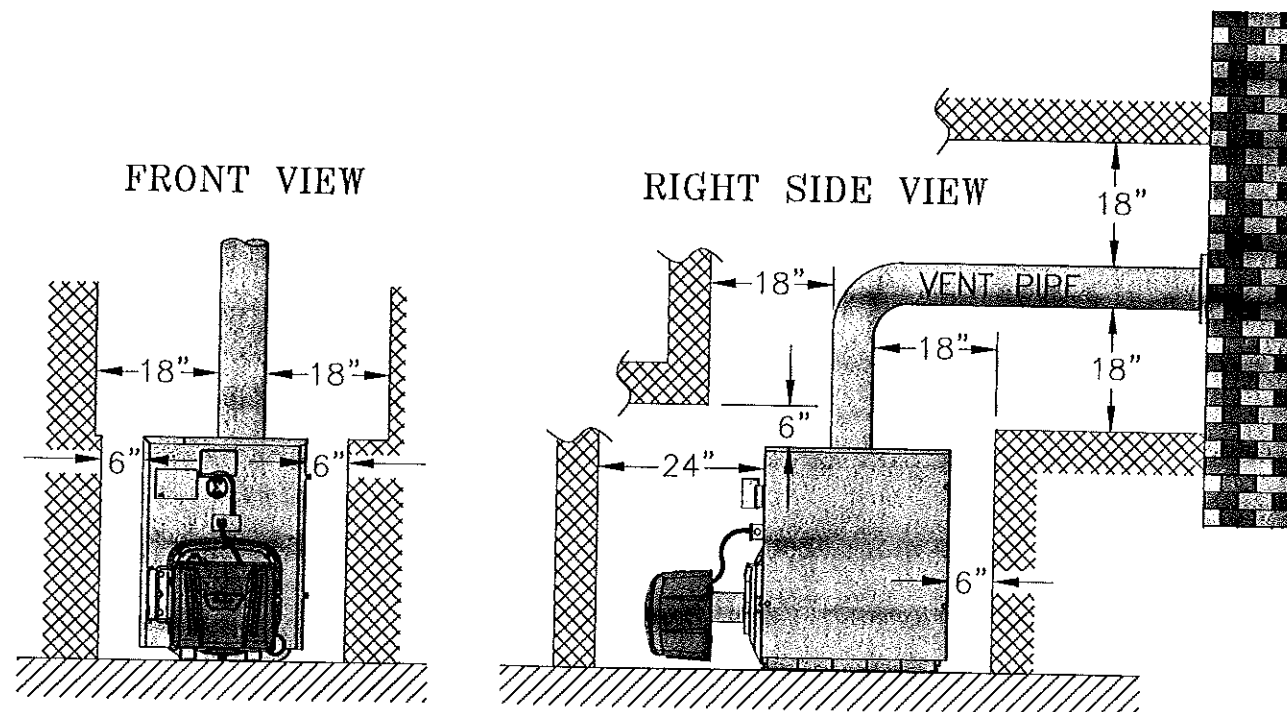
Minimum Installation Clearances To Combustible Materials (Inches)
